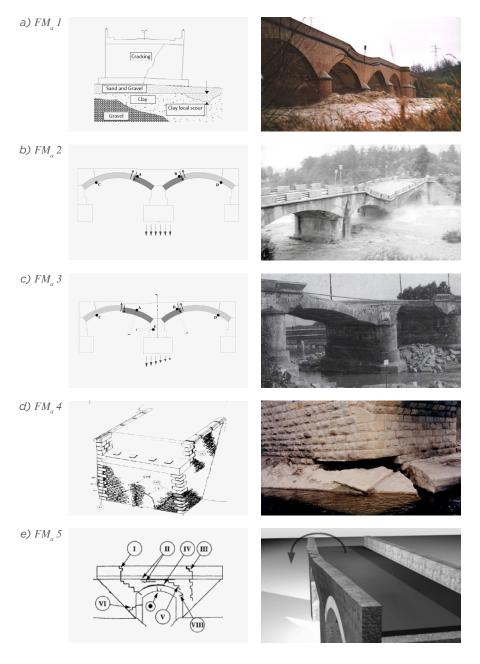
Failure modes of masonry arc bridges a) Fragmentation of a pier, (FHWA, 2011); b) Symmetrical, in-plane failure mode, (Zampieri, et al., 2017); c) Non-Symmetrical, in-plane failure mode (Zampieri, et al., 2017); d) Failure mode related to fragmentation of an abutment, (SÉTRA, 1996) e) Out-of-the -plane failure and spandrel wall displacement, (SÉTRA, 1996);
